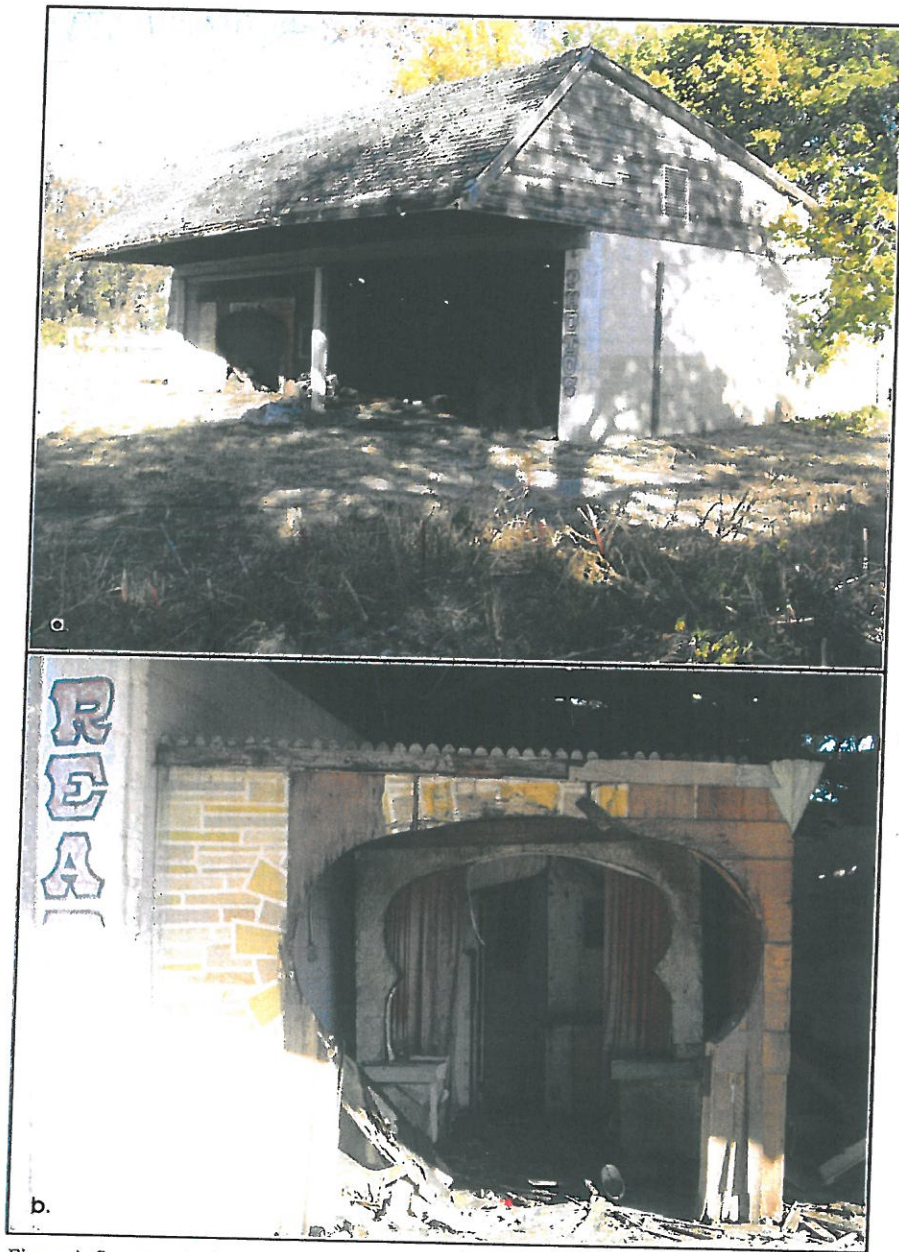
Structure 1, showing degree of deterioration: a) view from east b) closer view of the remains of the fortune-teller's section.
